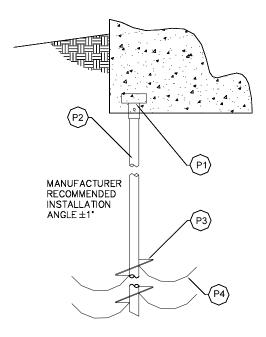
TYPE B DIRECT LOAD APPLICATION
